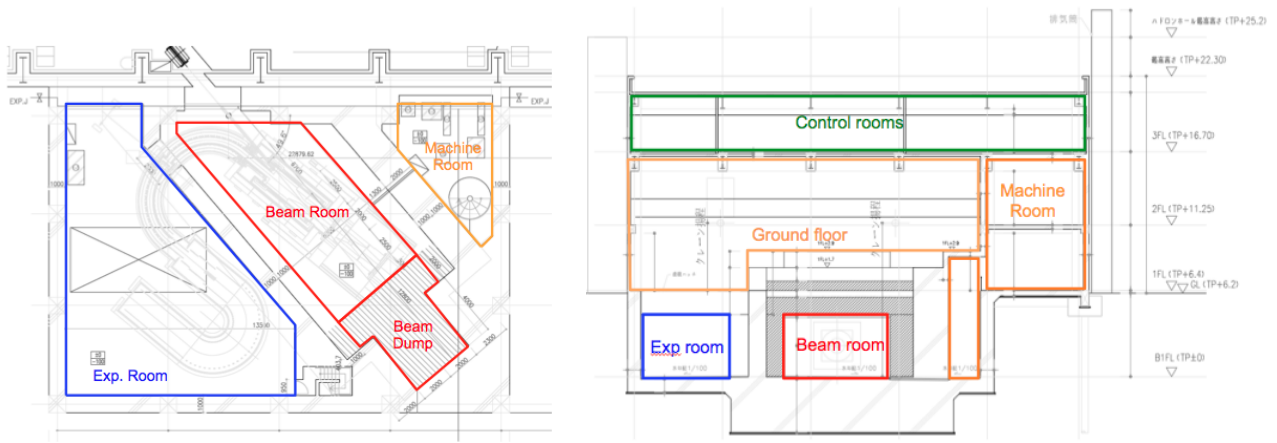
The segmentation of the basement floor (left) and a cross-section view (right) of the COMET building.
